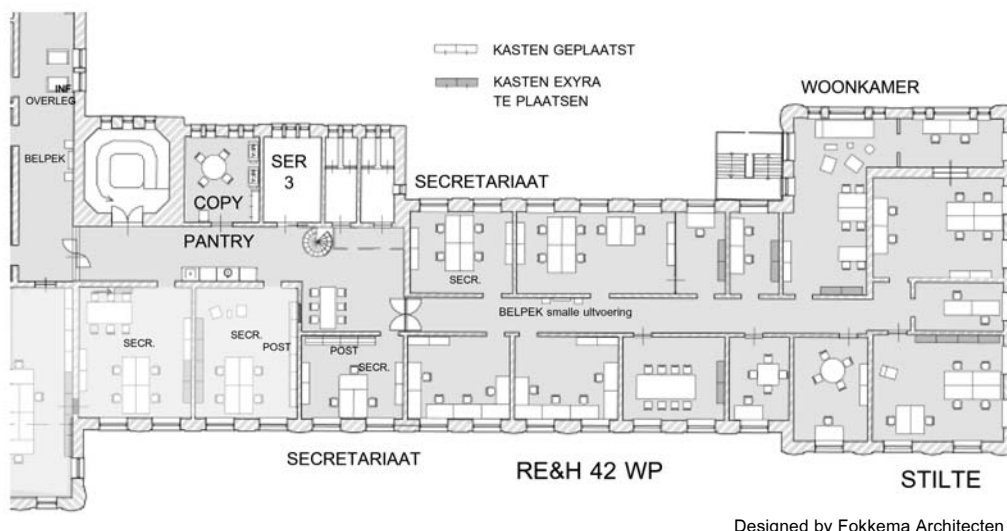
Floor plan with furniture layout in the Department of Real Estate & Housing.
